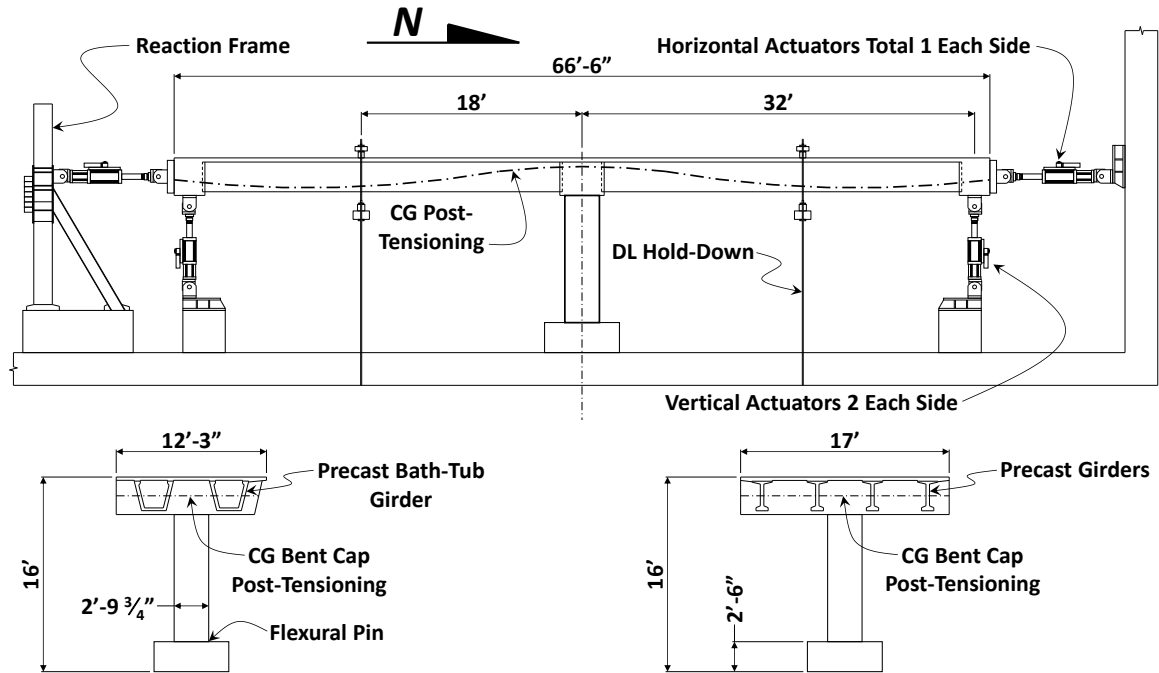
Test setup for model bridge specimens (adapted from Holombo, Priestley, and Seible, 2000)
